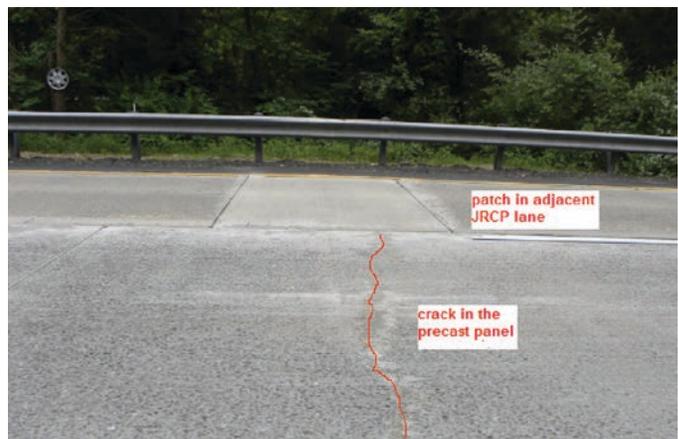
Crack in a precast panel associated with a patch in the adjacent lane on I-66 in Virginia.
